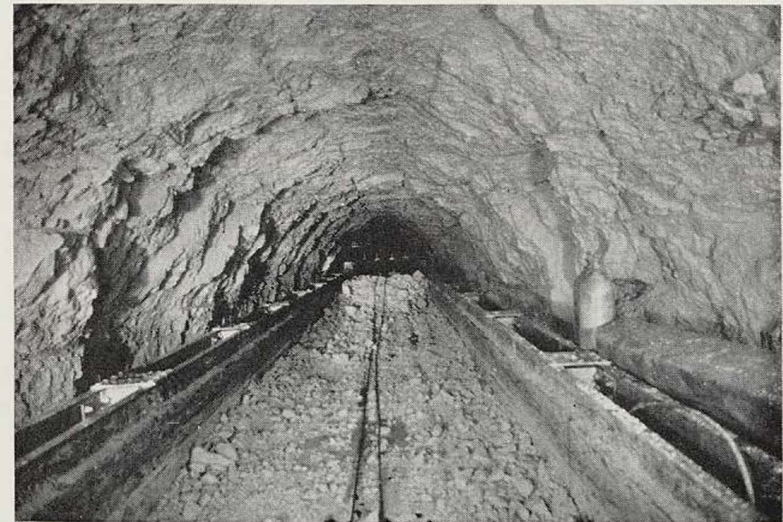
Drag line loading mucking machine Chicago Avenue Tunnel
